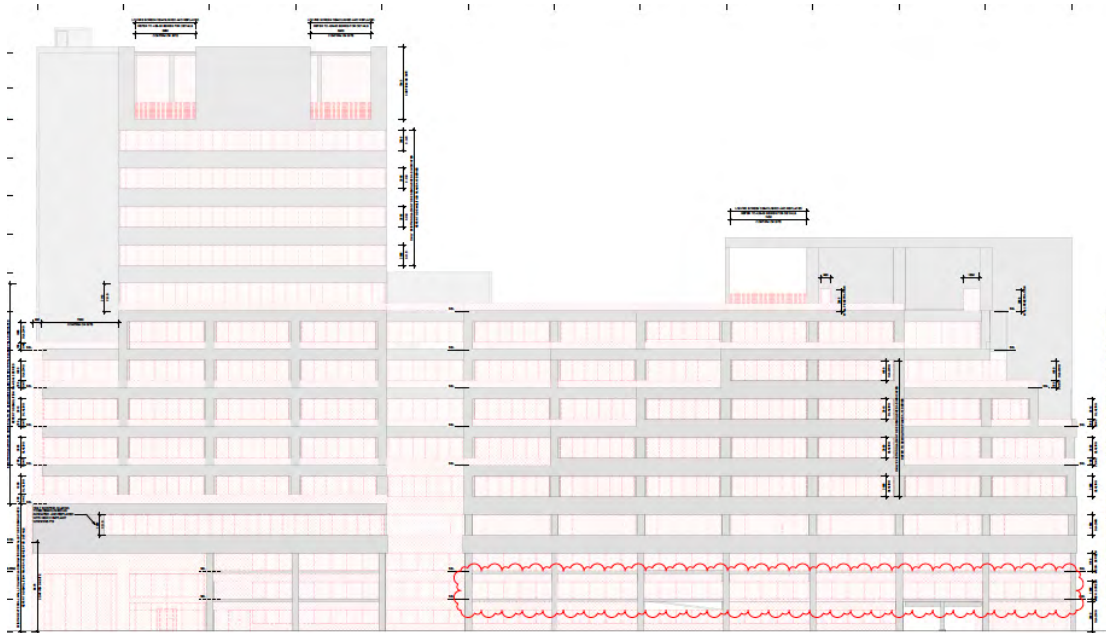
Proposed Demolition Elevation depicting extent of demolition to the northern facade. From Drawing A15-210
